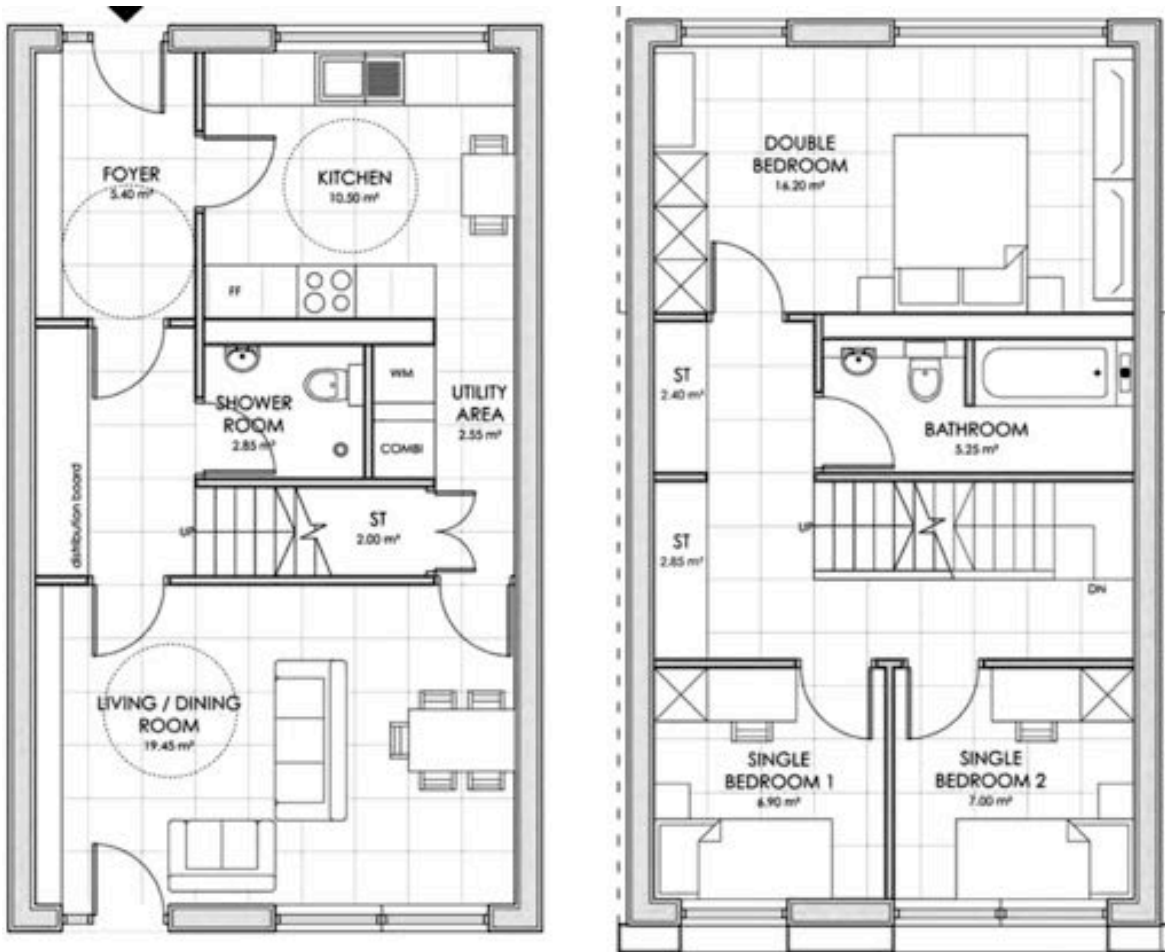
Floor plan the EPH design. Left: Ground floor plan. Right: First floor plan.
